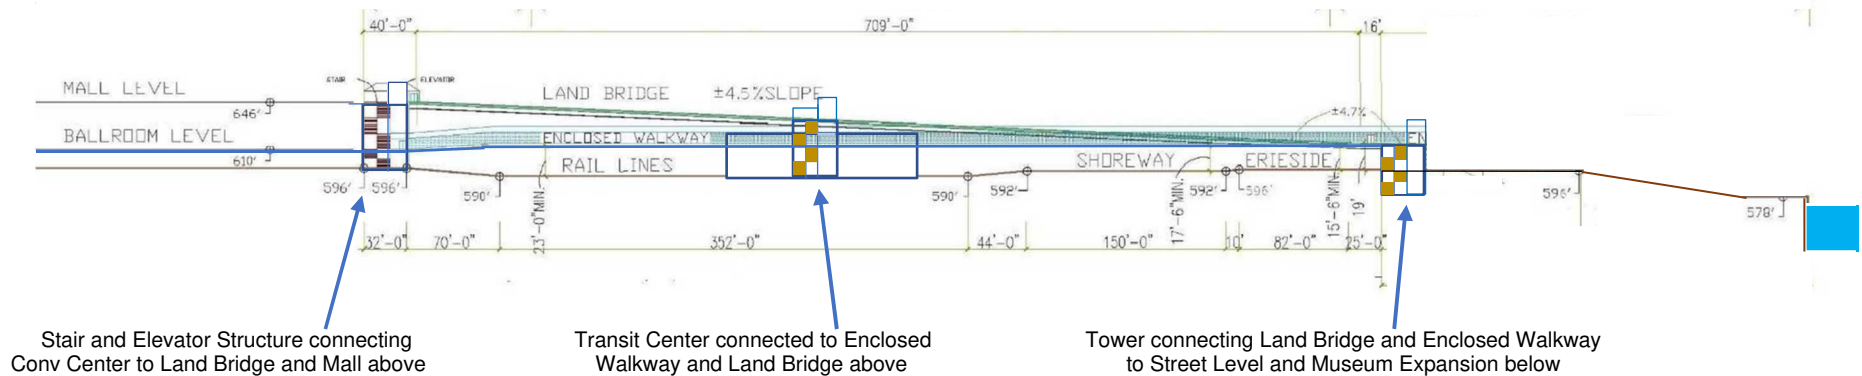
Phase 1 Land Bridge Elevation showing Enclosed Walkway and Access Towers
